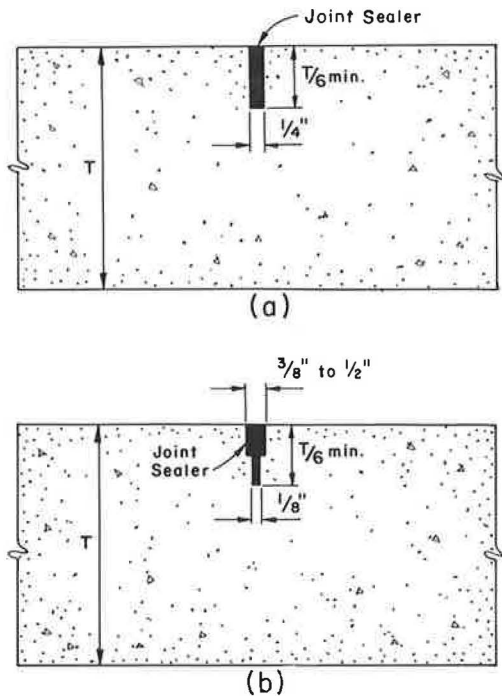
Sawed contraction joints in concrete pavement: (a) short joint intervals, and (b) long joint intervals.
